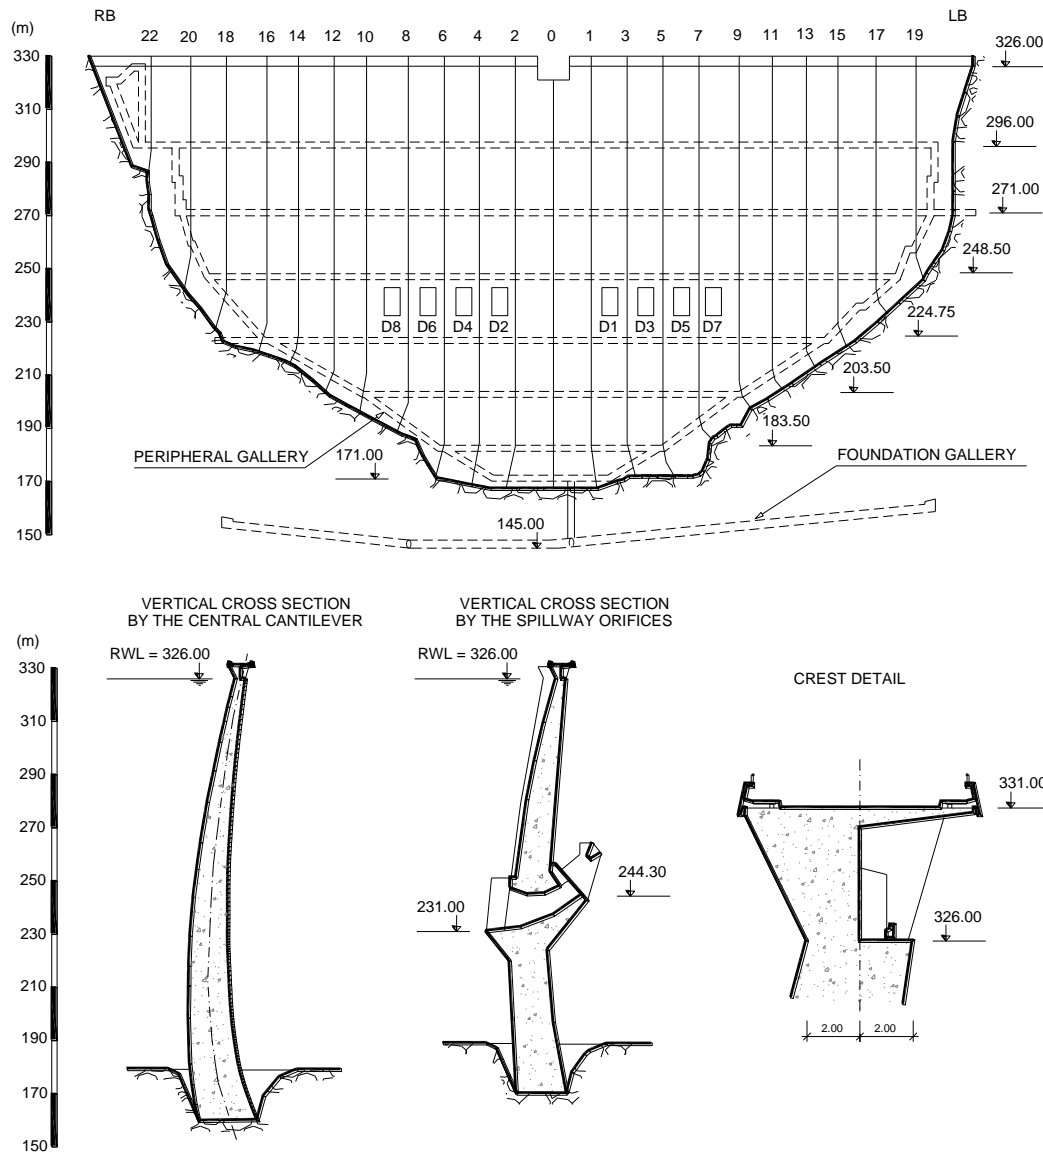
Cahora Bassa dam. Downstream elevation, vertical cross-sections and crest detail
